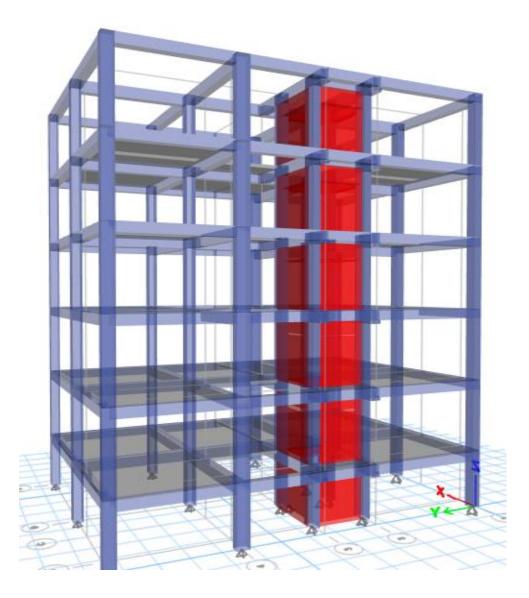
3D view of a residential buildings slab, beam, column, lift
